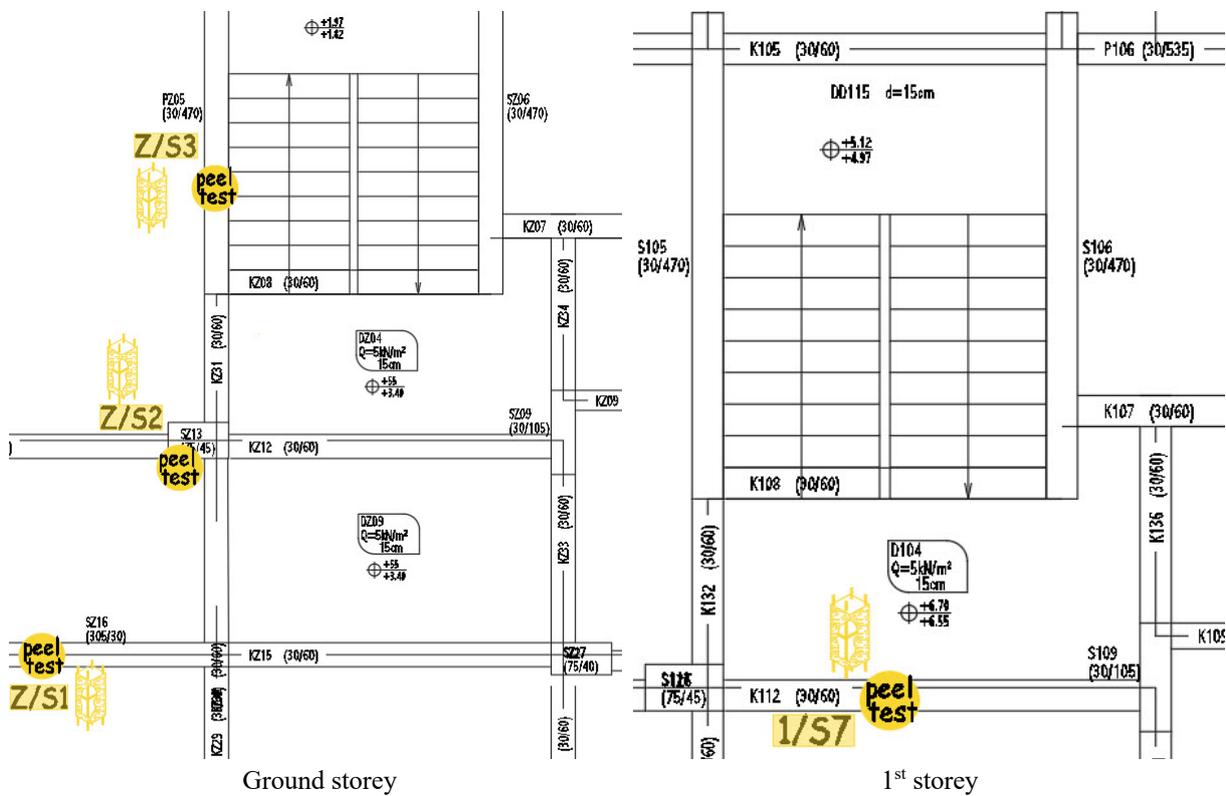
Locations of the peel test structural elements on the ground storey of Kalaycılar primary school
